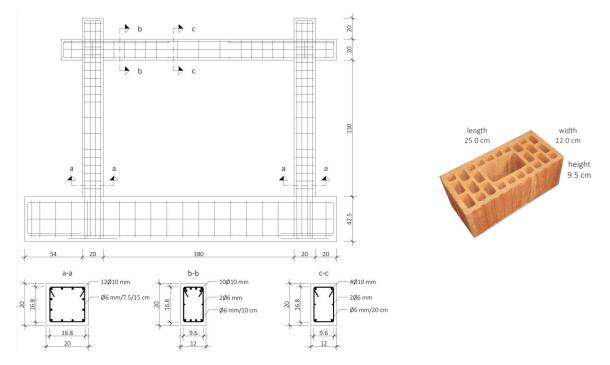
Design and construction detailing drawings of 1/2.5 scaled r. c. frame structure used in laboratory tests (left) and clay block masonry units used (right) [4,5]
